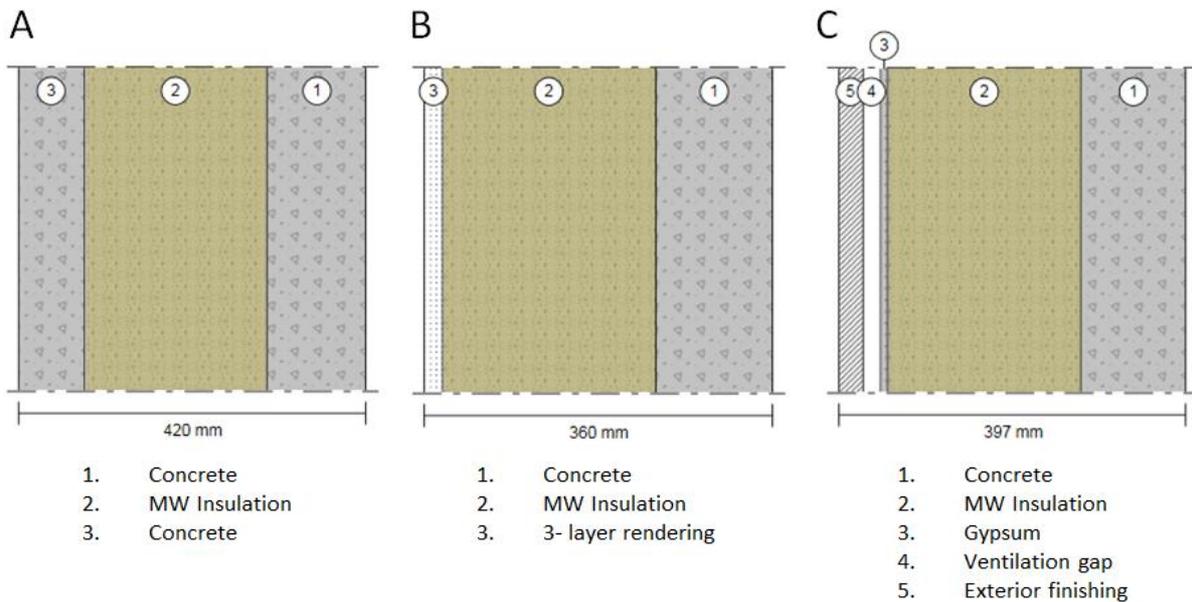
The intersections of the wall structures used in simulations: A) a concrete sandwich panel, B) a rendered façade, and C) a ventilated façade. Constructions based on data given by Ojanen [5] [6].
